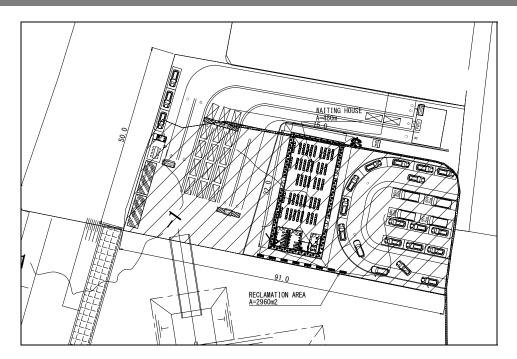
Terminal Layout Plan of the Tadjourah Port
